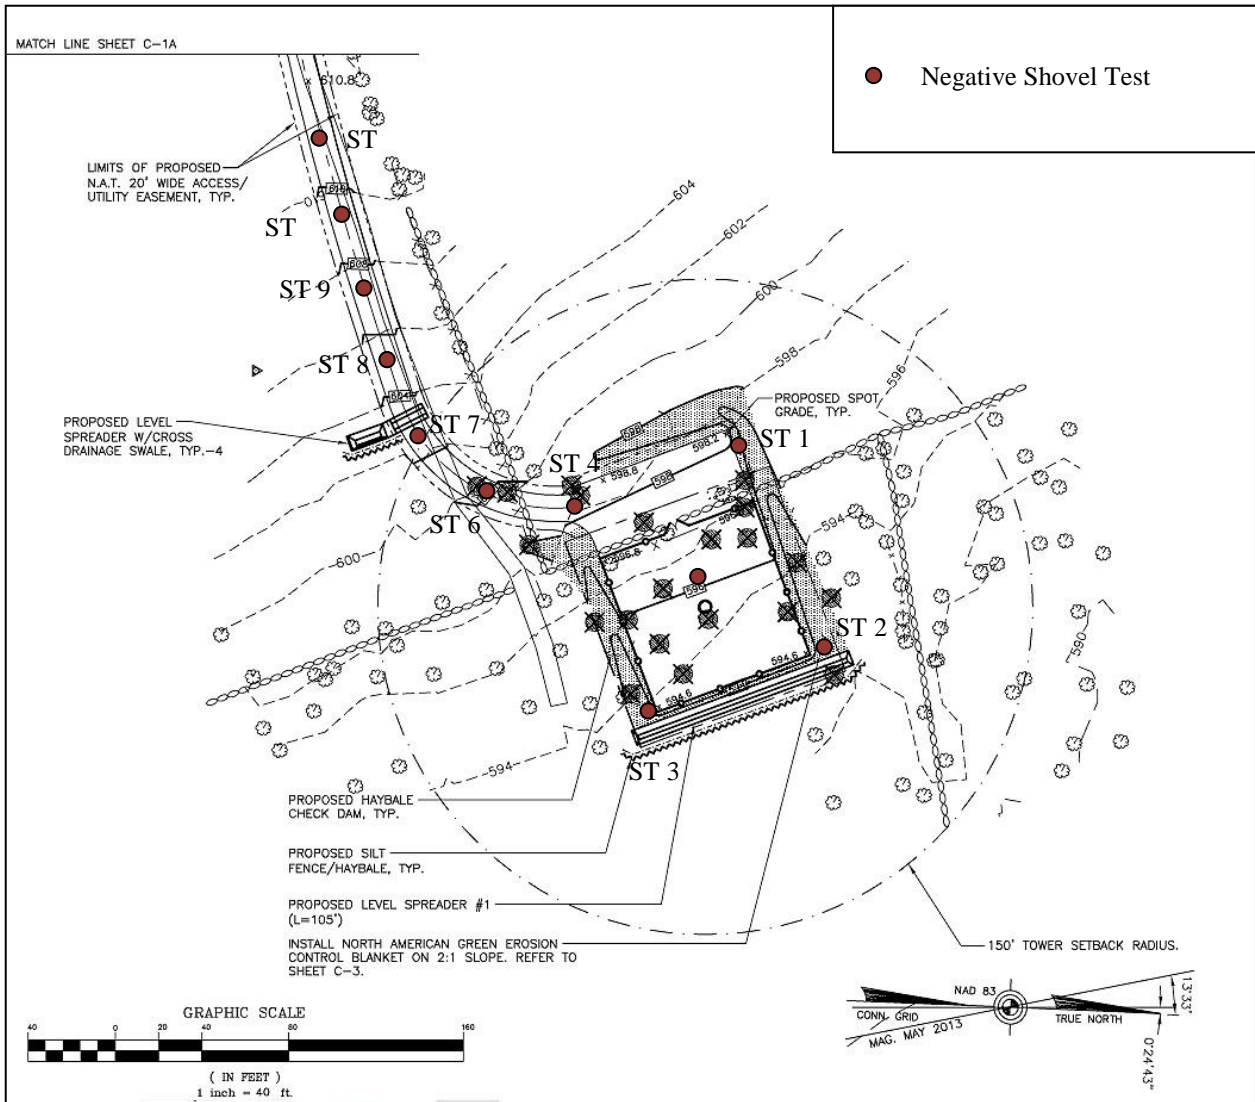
Plan view of proposed lease area and eastern portion of access road associated with Alternate 1 (locations of excavated shovel tests noted on plan view).
